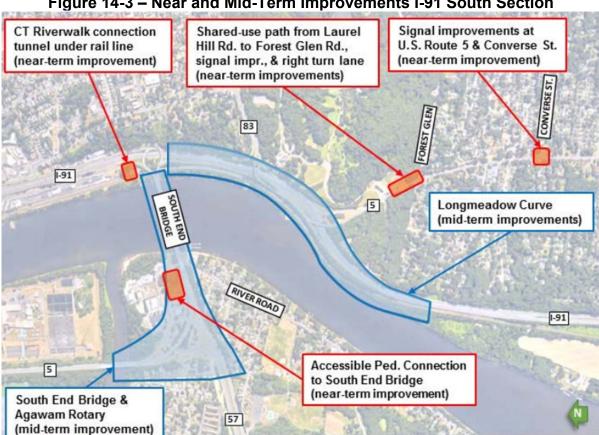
Near and Mid-Term Improvements I-91 South Section
